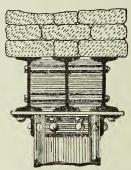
Girders supporting Stone Wall over Shop Front.
